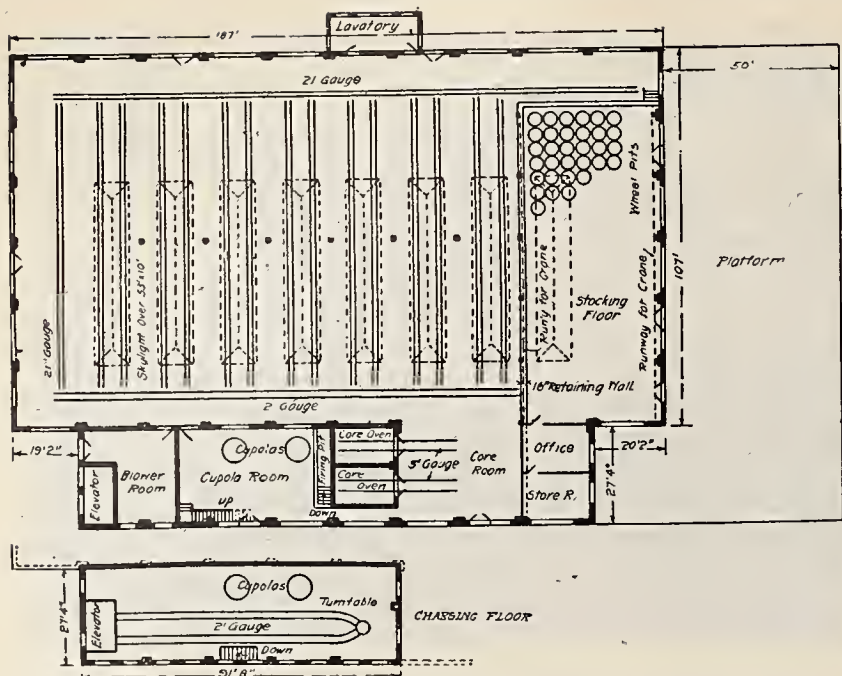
PLAN OF WHEEL FOUNDRY C. P. R. SHOPS.
